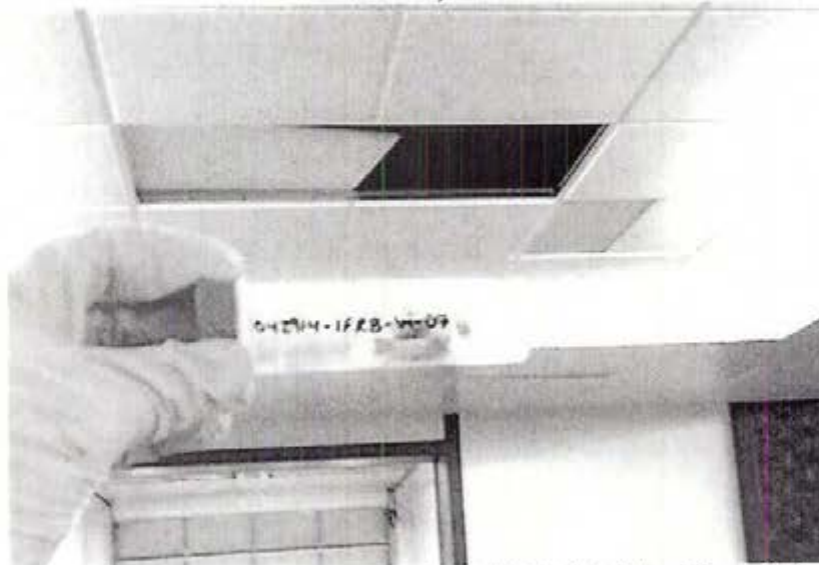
Lead wipe sample (042914-IFRB-W-07) collected from old wood paneling above the drop ceiling; west end of hallway.
